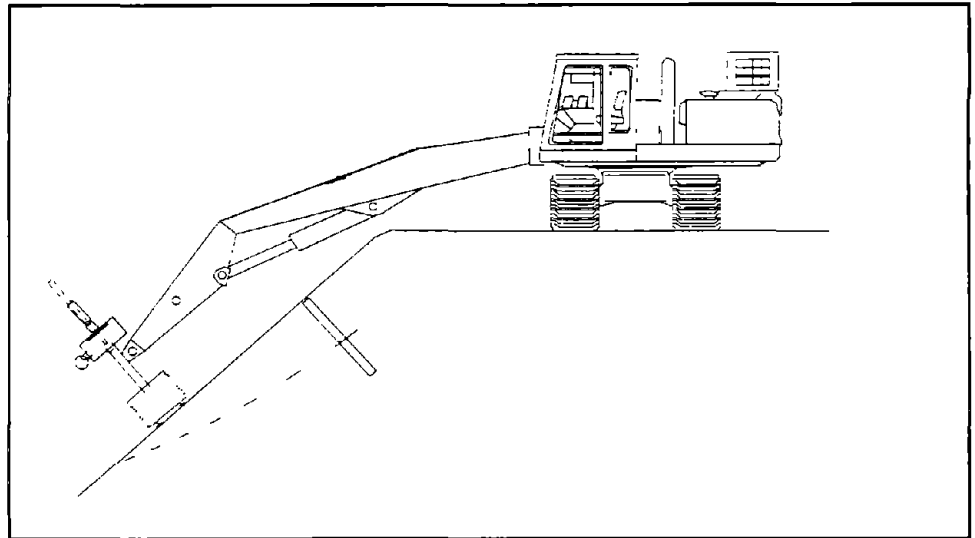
Illustration of the soil nail launcher attached to a hydraulic excavator.
